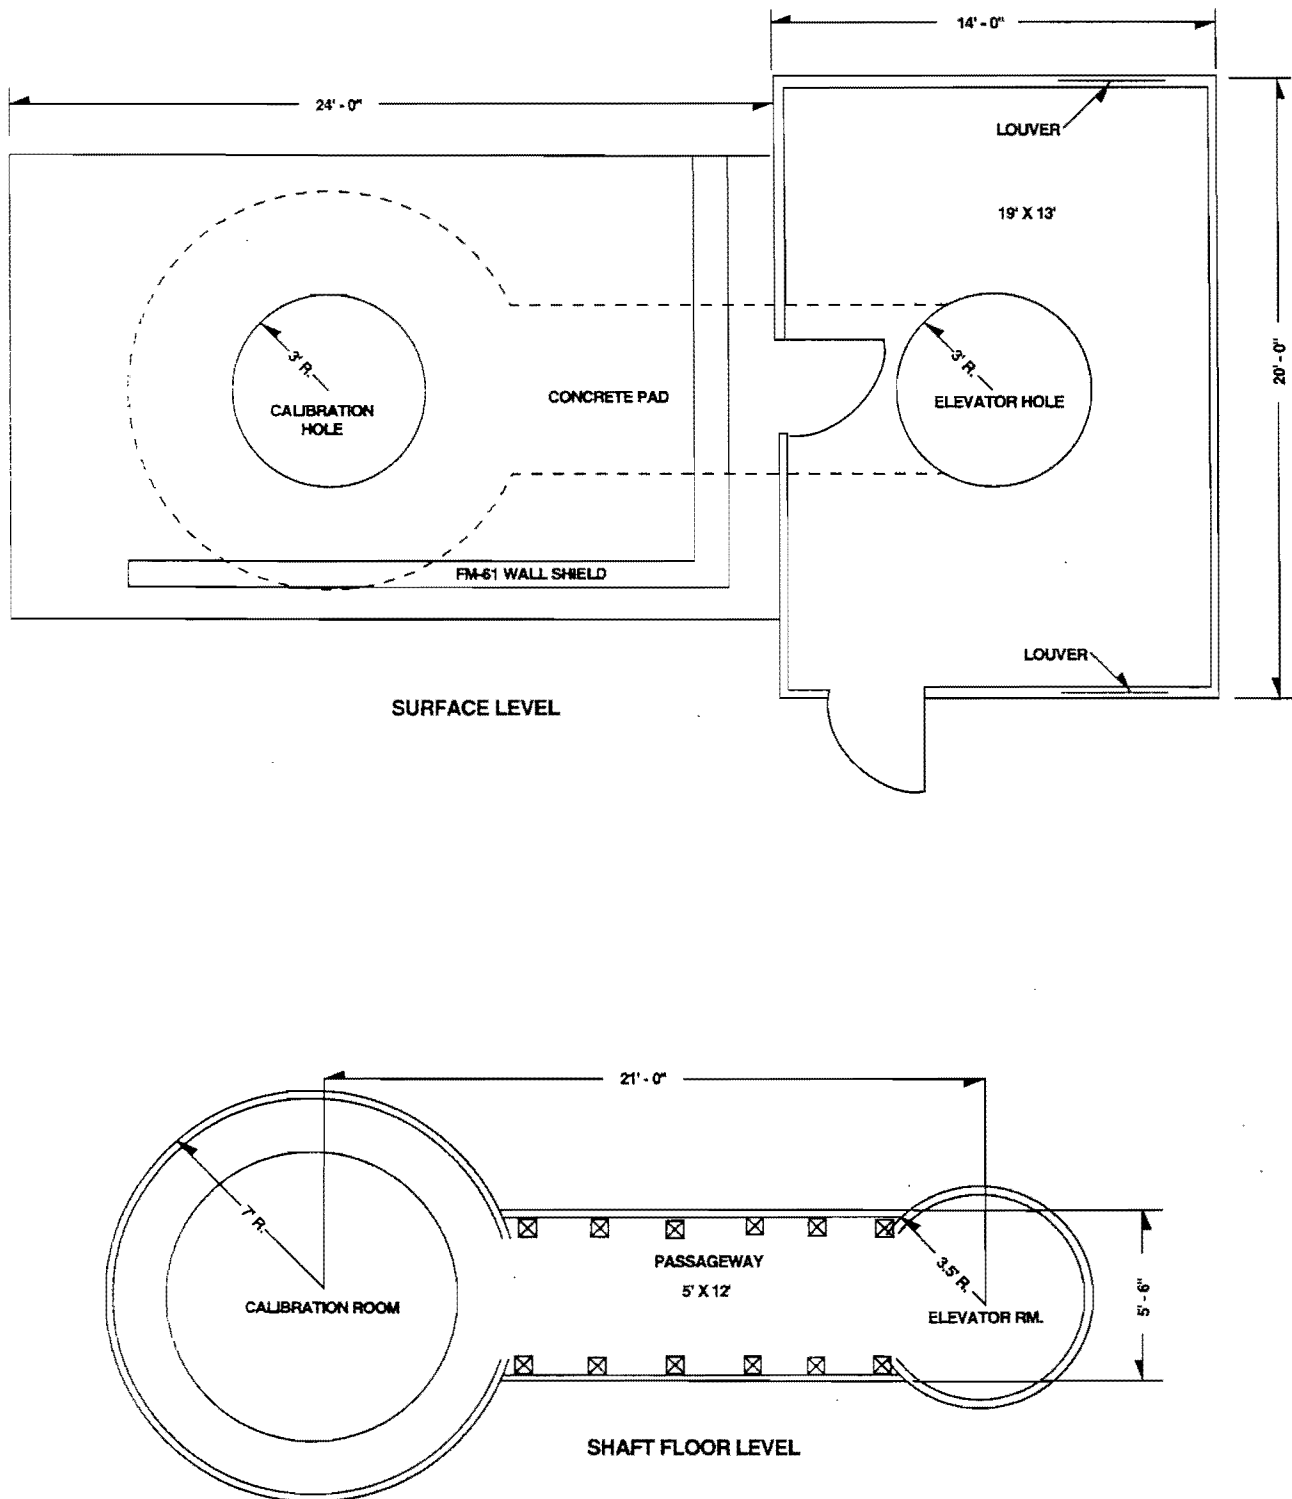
Engineering drawings of the underground chamber complex at Area 10. Plan view at surface and floor levels. [Adapted from engineering drawings ENG-R 3236, 3/11/64 (00-0045) and ENG-R 3337, 9/11/64 (03-0046)].
